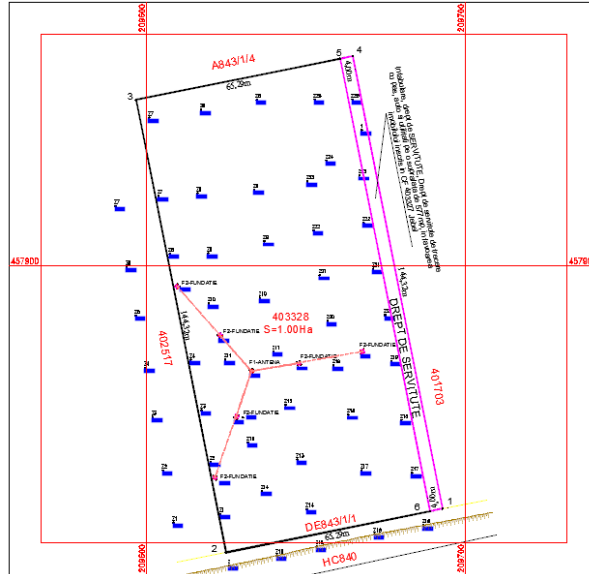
Situation plan for the building no. 403328, Jebel, Timiș County
